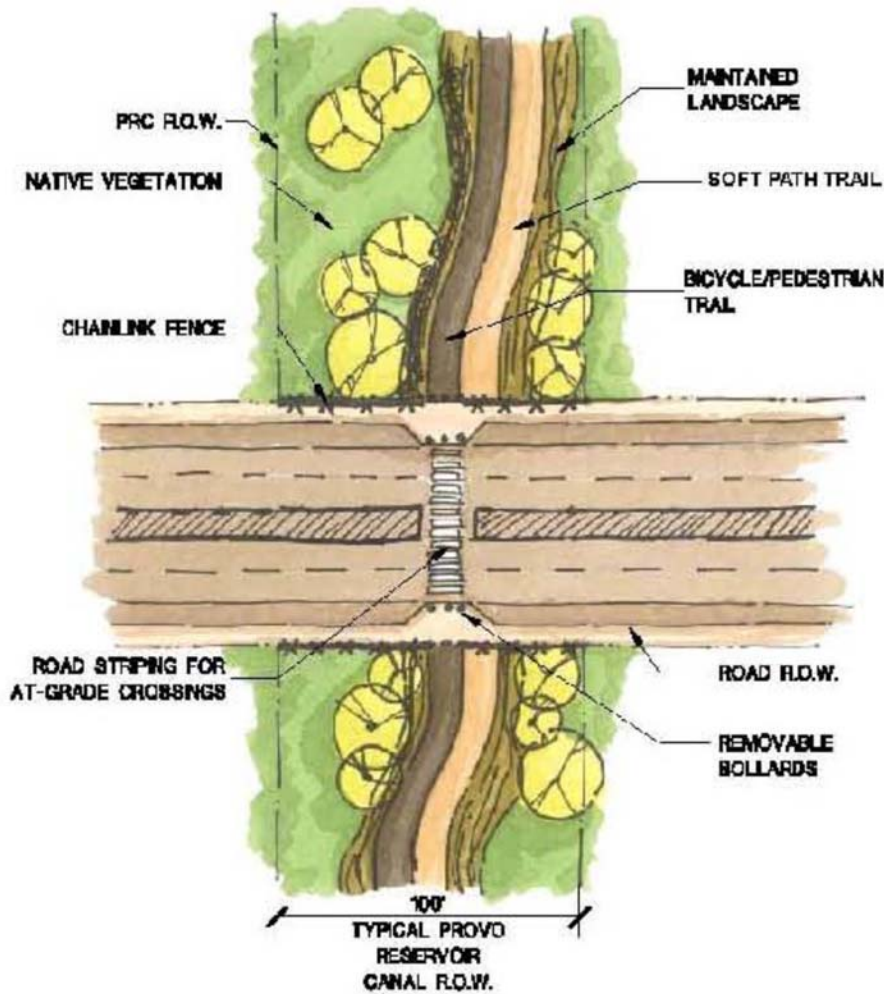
Overhead view of hard and soft surface trails and an Example of a Trail/Street Crossing
